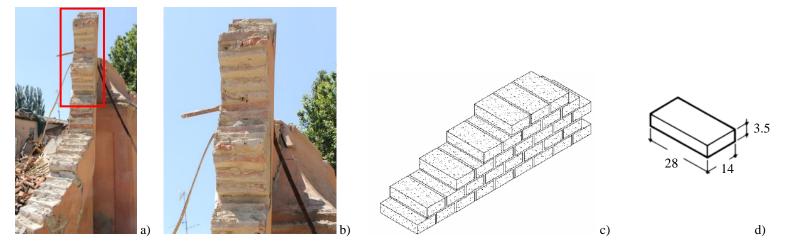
Single header brick masonry bond in church I2: general view (a), detail (b) and sketch of the bond type adapted from Borri (2006) (c), brick dimensions in cm.
